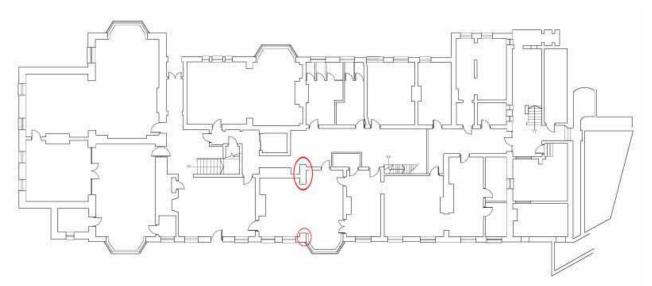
Plan of the modern house, with the existing evidence for the earlier western wall in the dining room ringed.
